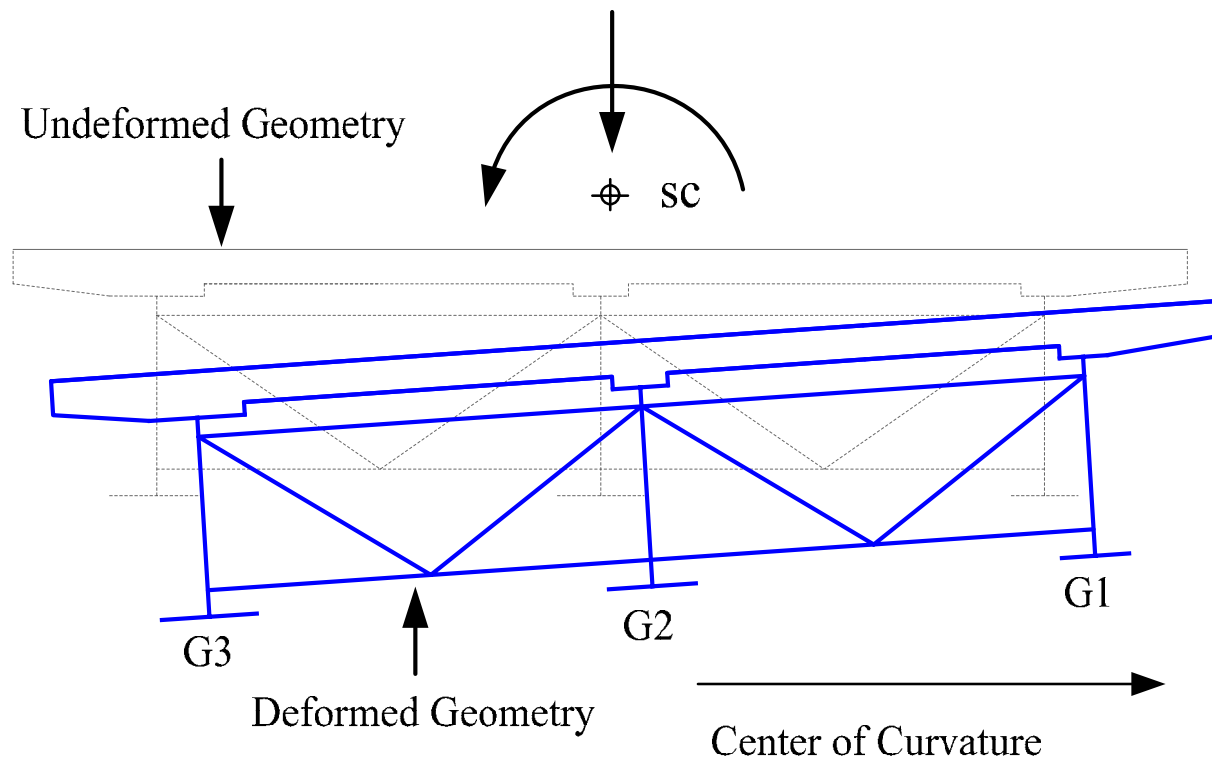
Schematic of showing typical overall bridge cross-section movements toward the center of curvature as well as in the downward direction.
